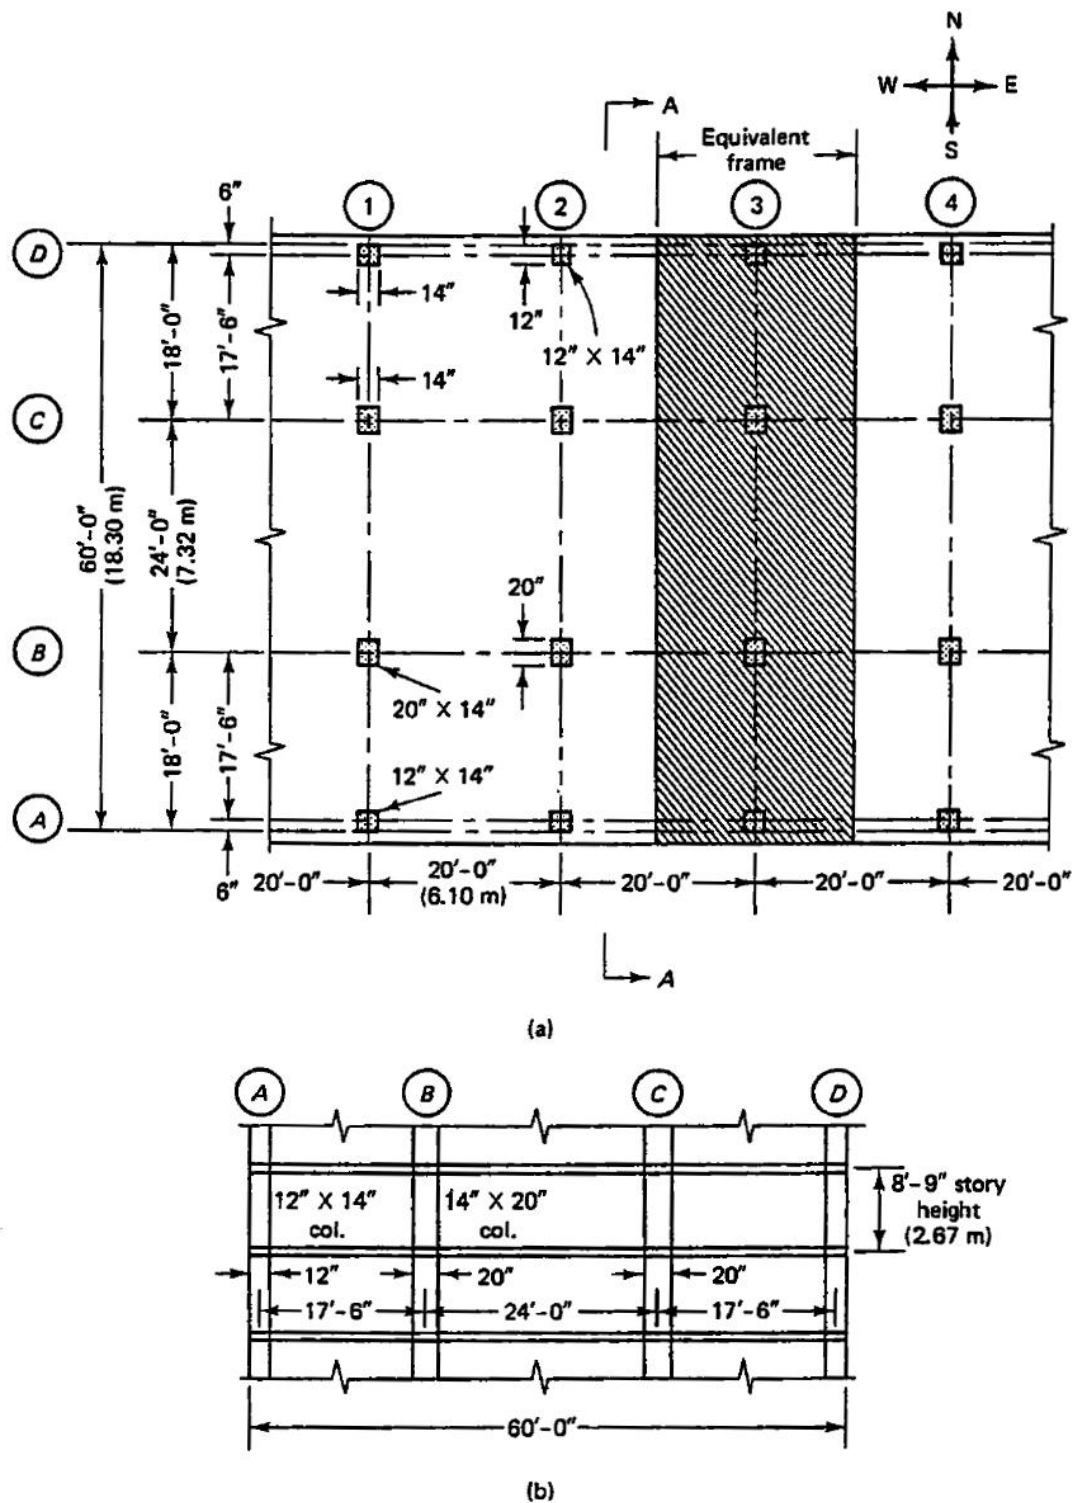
Flat-plate apartment structure in Example 9.1. (a) Plan. (b) Section A-A, N-S.
